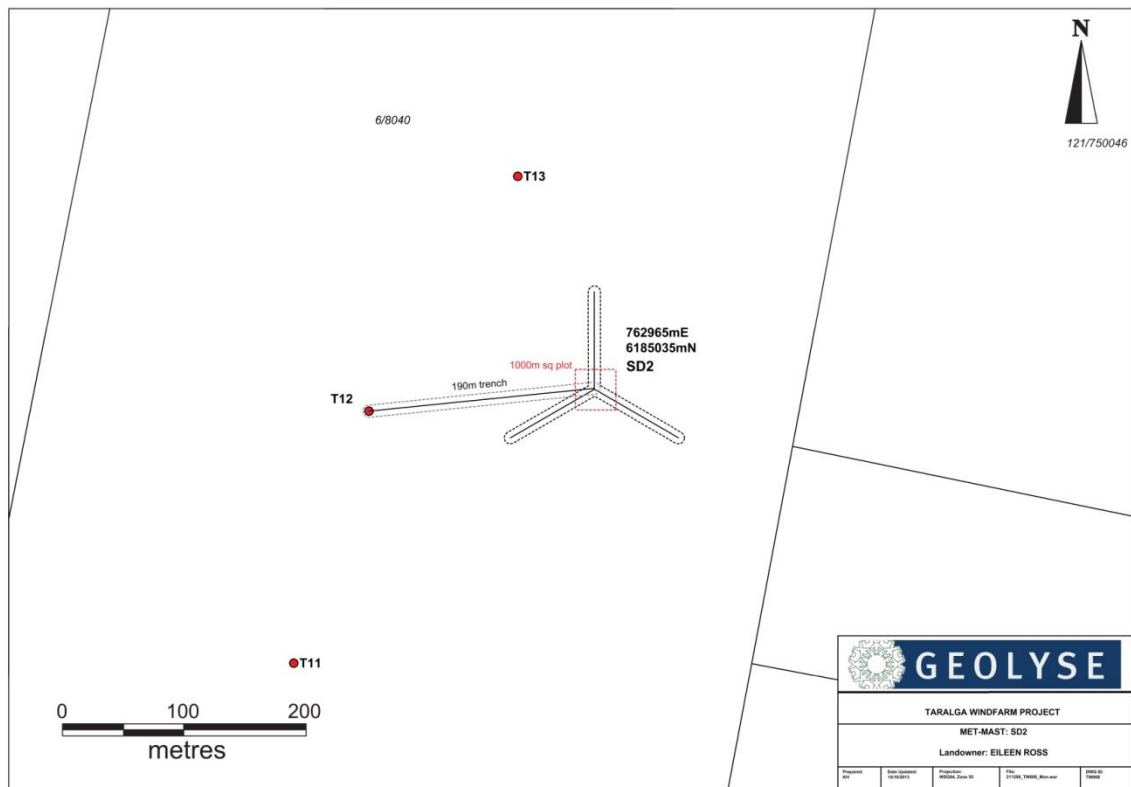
Plan of the proposed works at met-mast #SD2 and proposed trench to Turbine 12.
